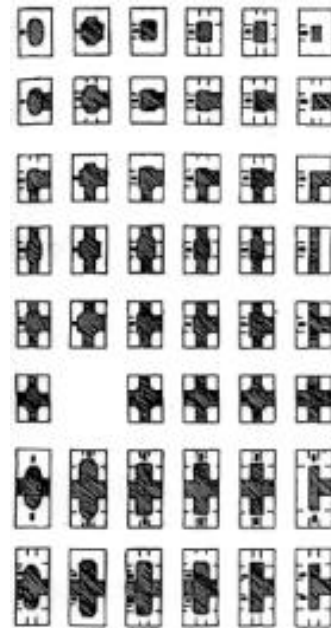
The Matrix of Planimetric Organizations of the 'Turkish house: plan type with a central sofa
